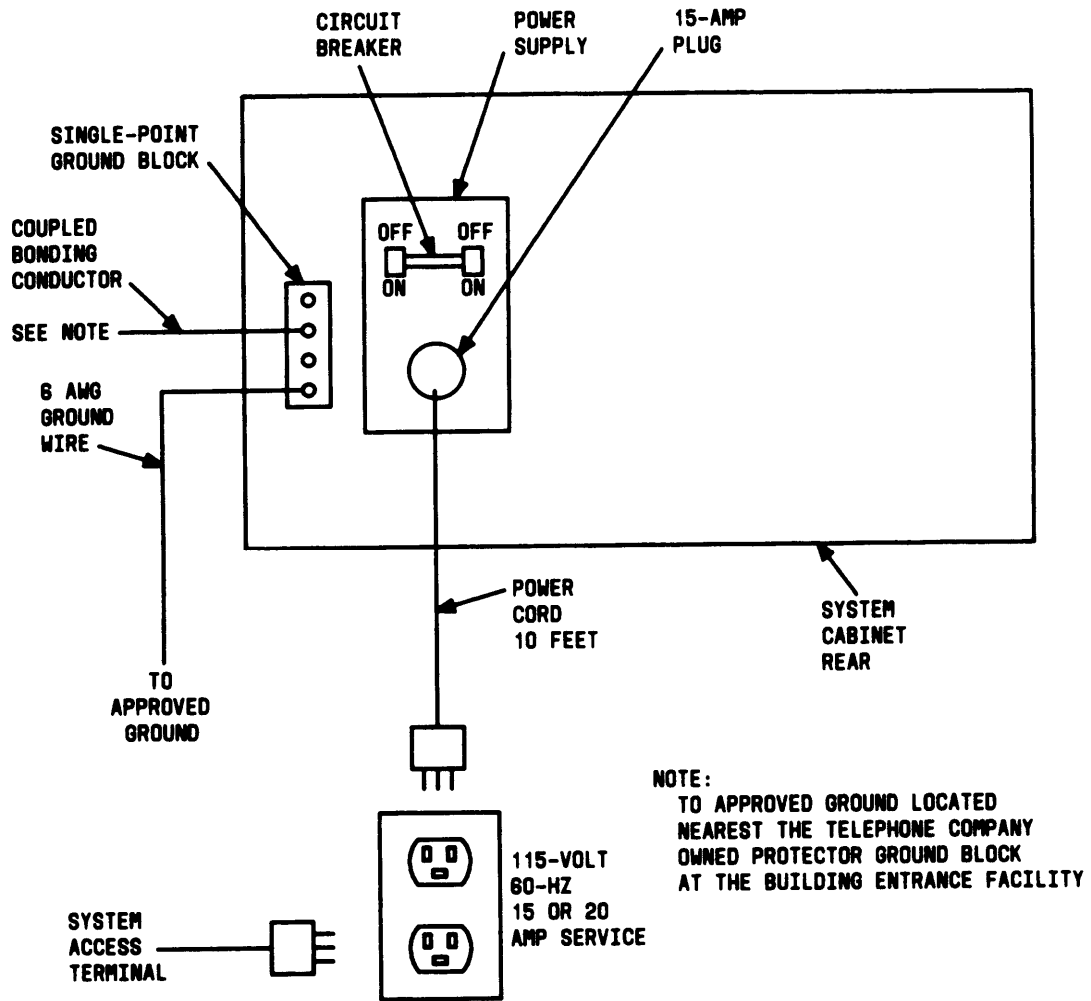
Typical System 75 XE Power and Grounding Layout
